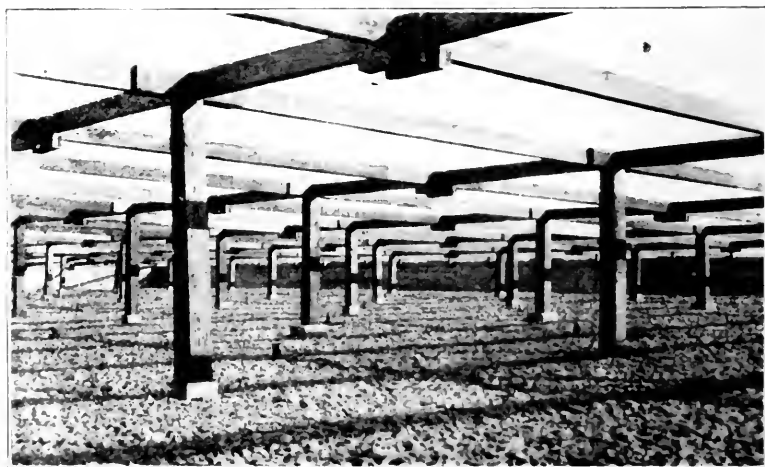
Sprinkling Filter Showing Roof Structure.
